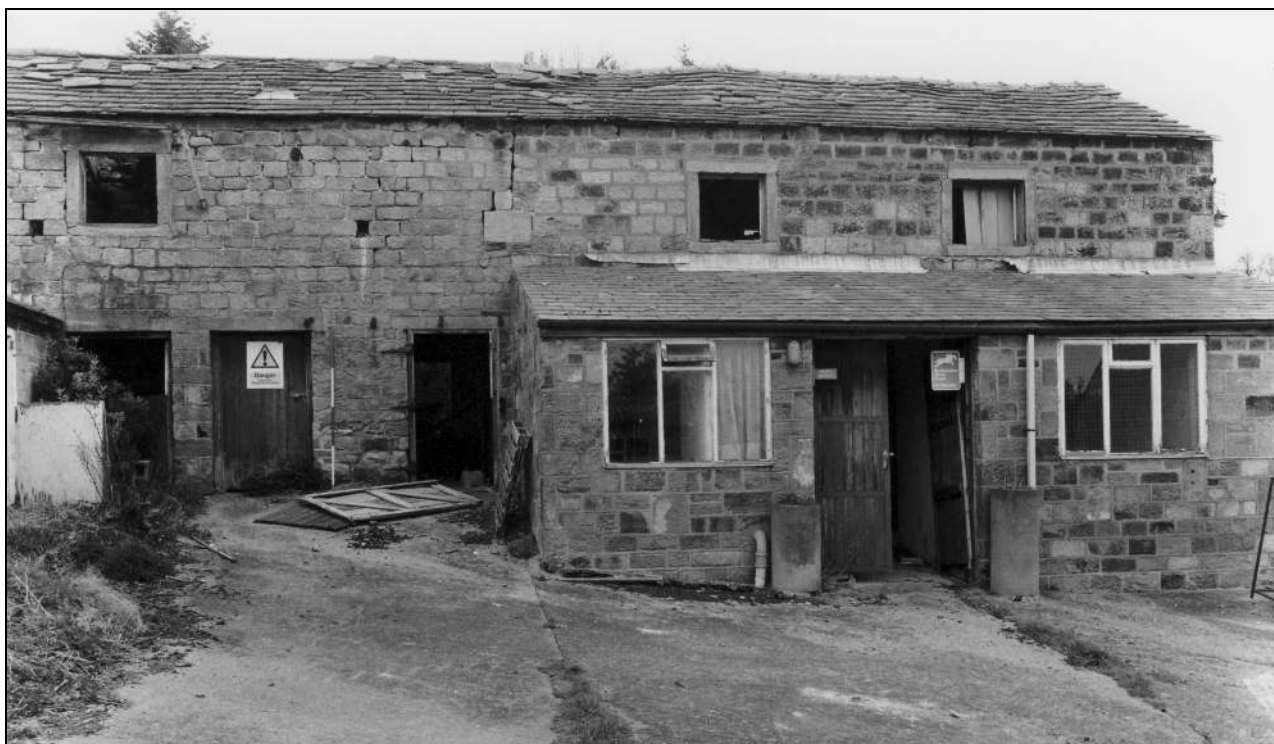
North range: south elevation (east part) (film 1, frame 17)
